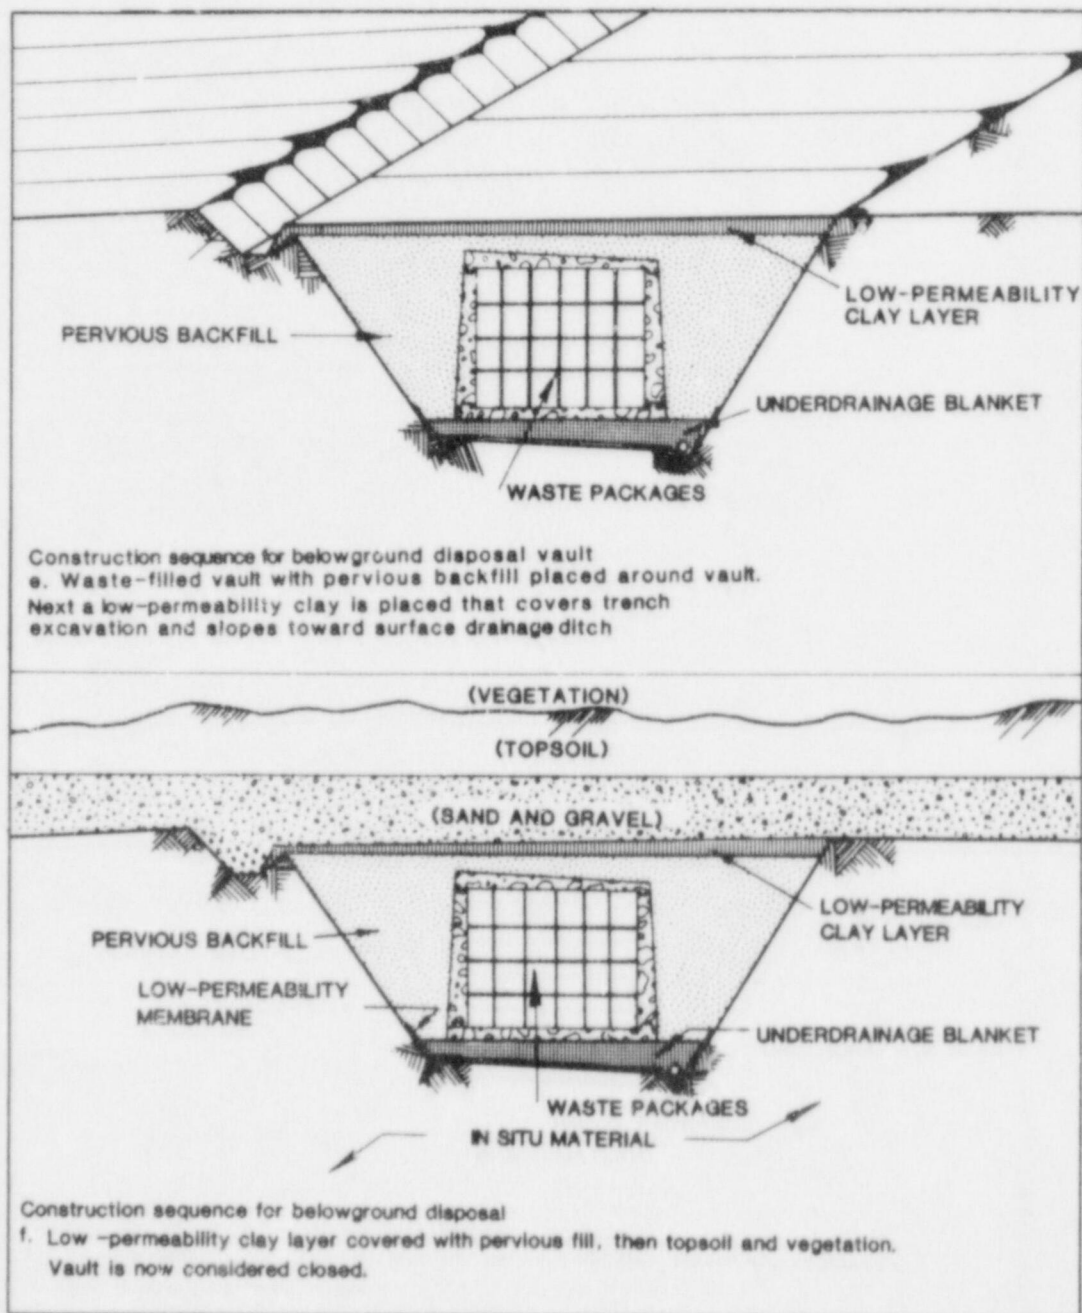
Construction sequence for cut and cover construction of belowground vault LLW disposal units. Figure 5e shows the waste filled disposal vault with roof in place and pervious backfill placed around vault. A low-permeability clay layer is shown above the pervious material above the vault roof. In Figure 5f the low-permeability layer has been covered with a pervious drainage layer, topsoil, and vegetation.
